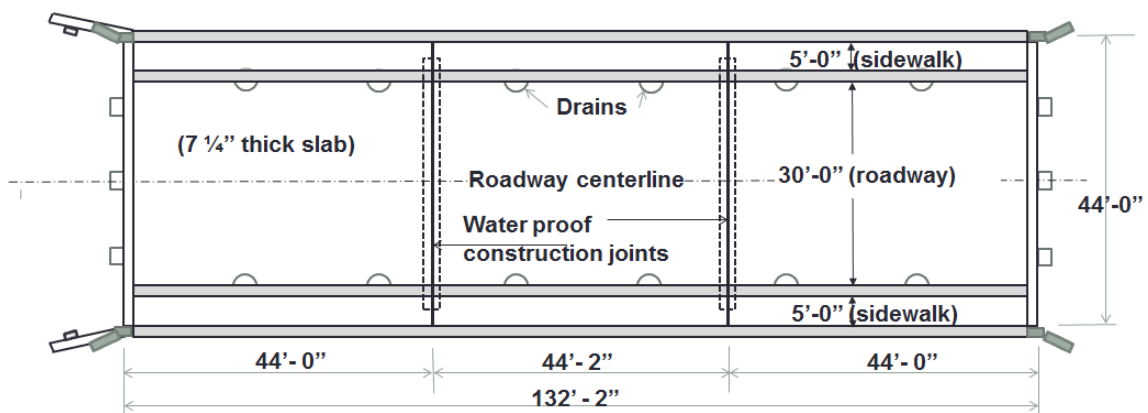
Plan view of Bridge #0283, Noyes Slough Bridge
